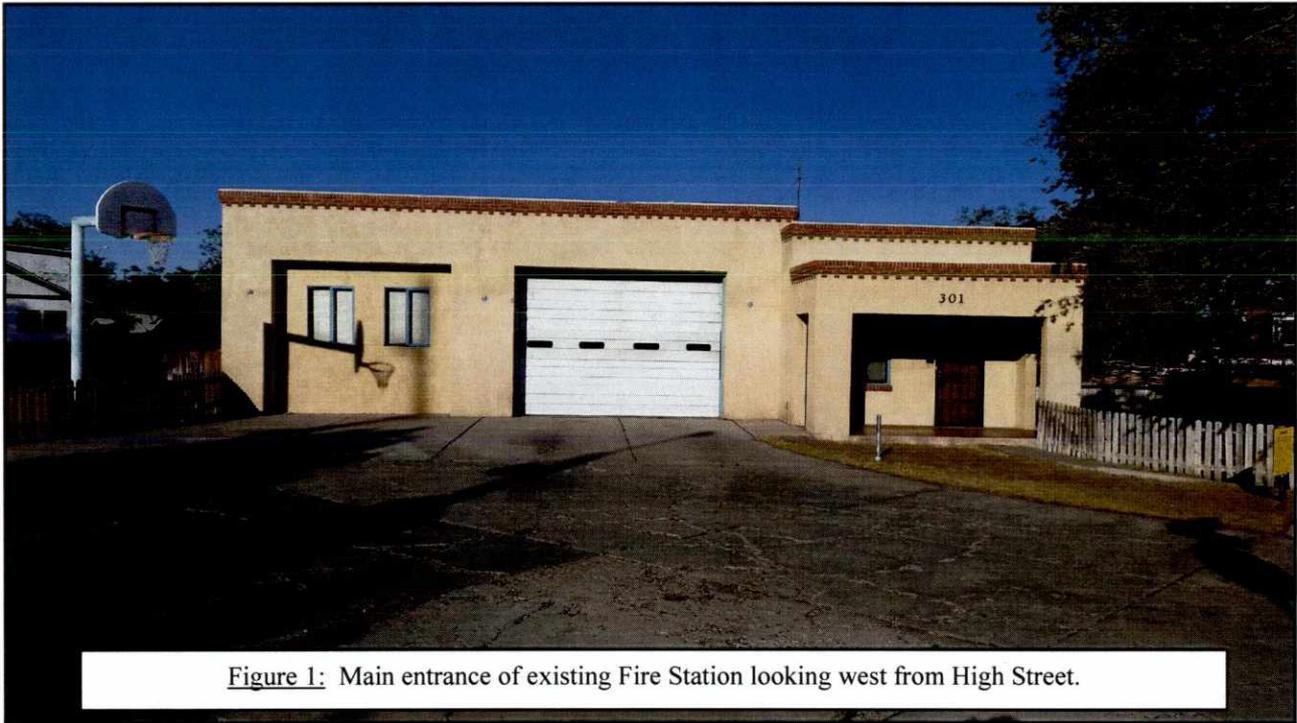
Main entrance of existing Fire Station looking west from High Street.
